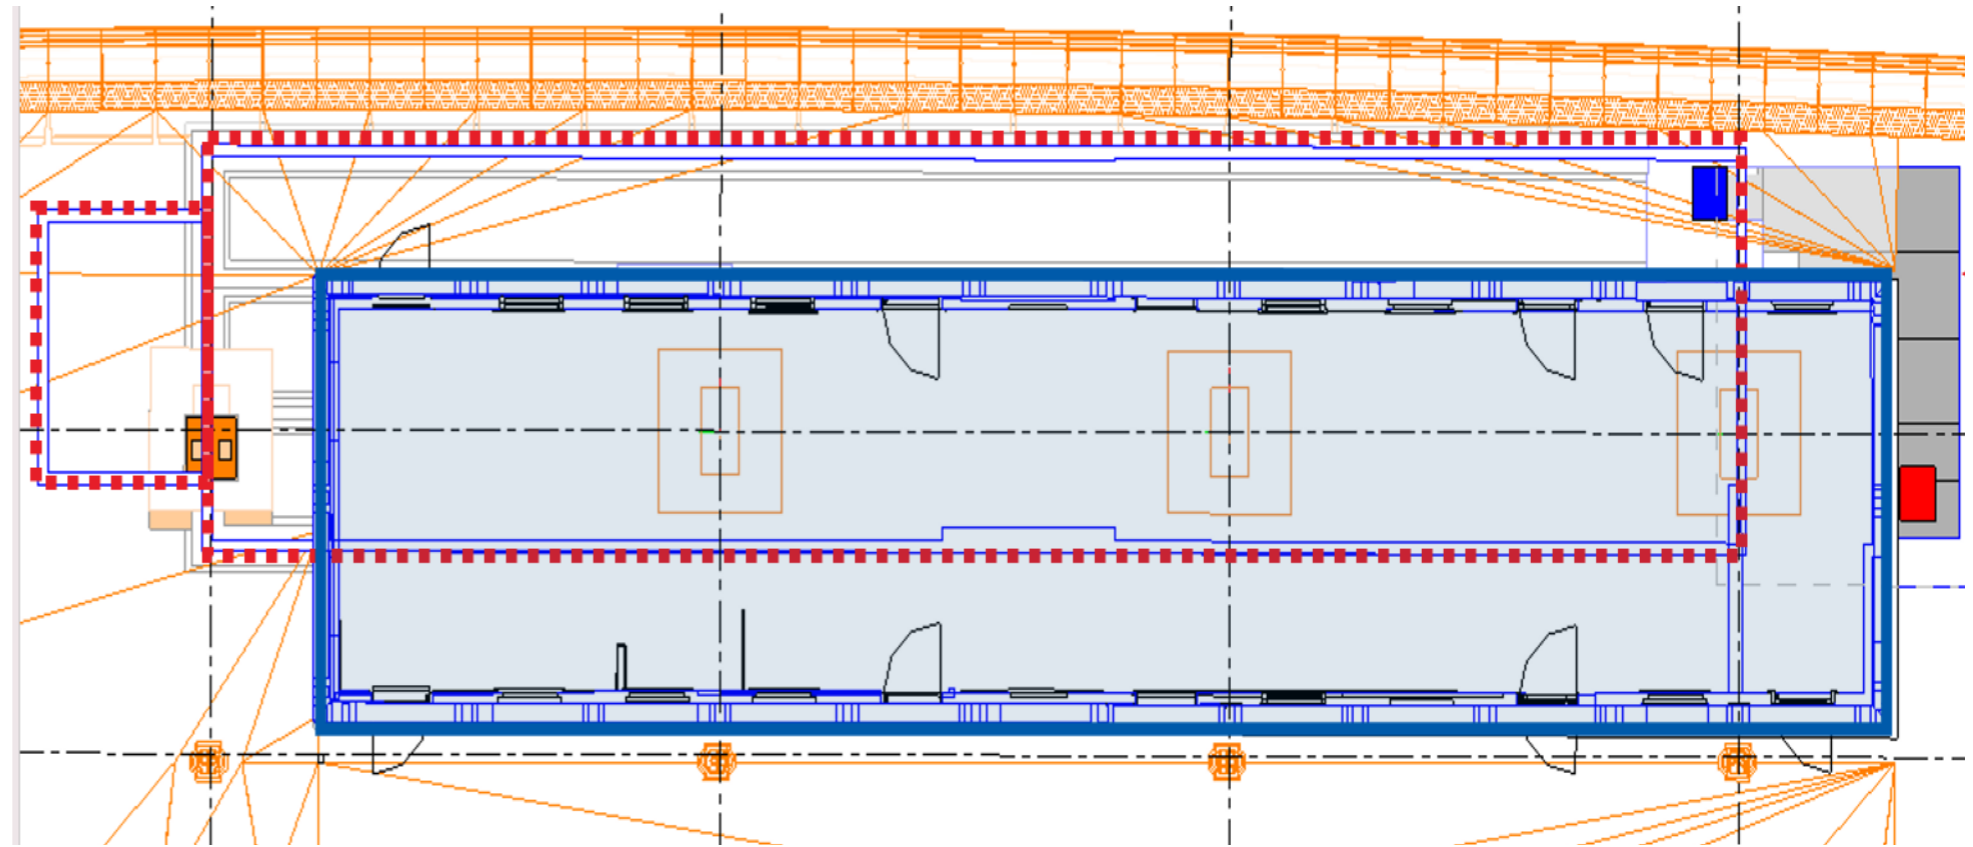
Proposed relocation plan - existing (red-dash) - proposed (blue)
